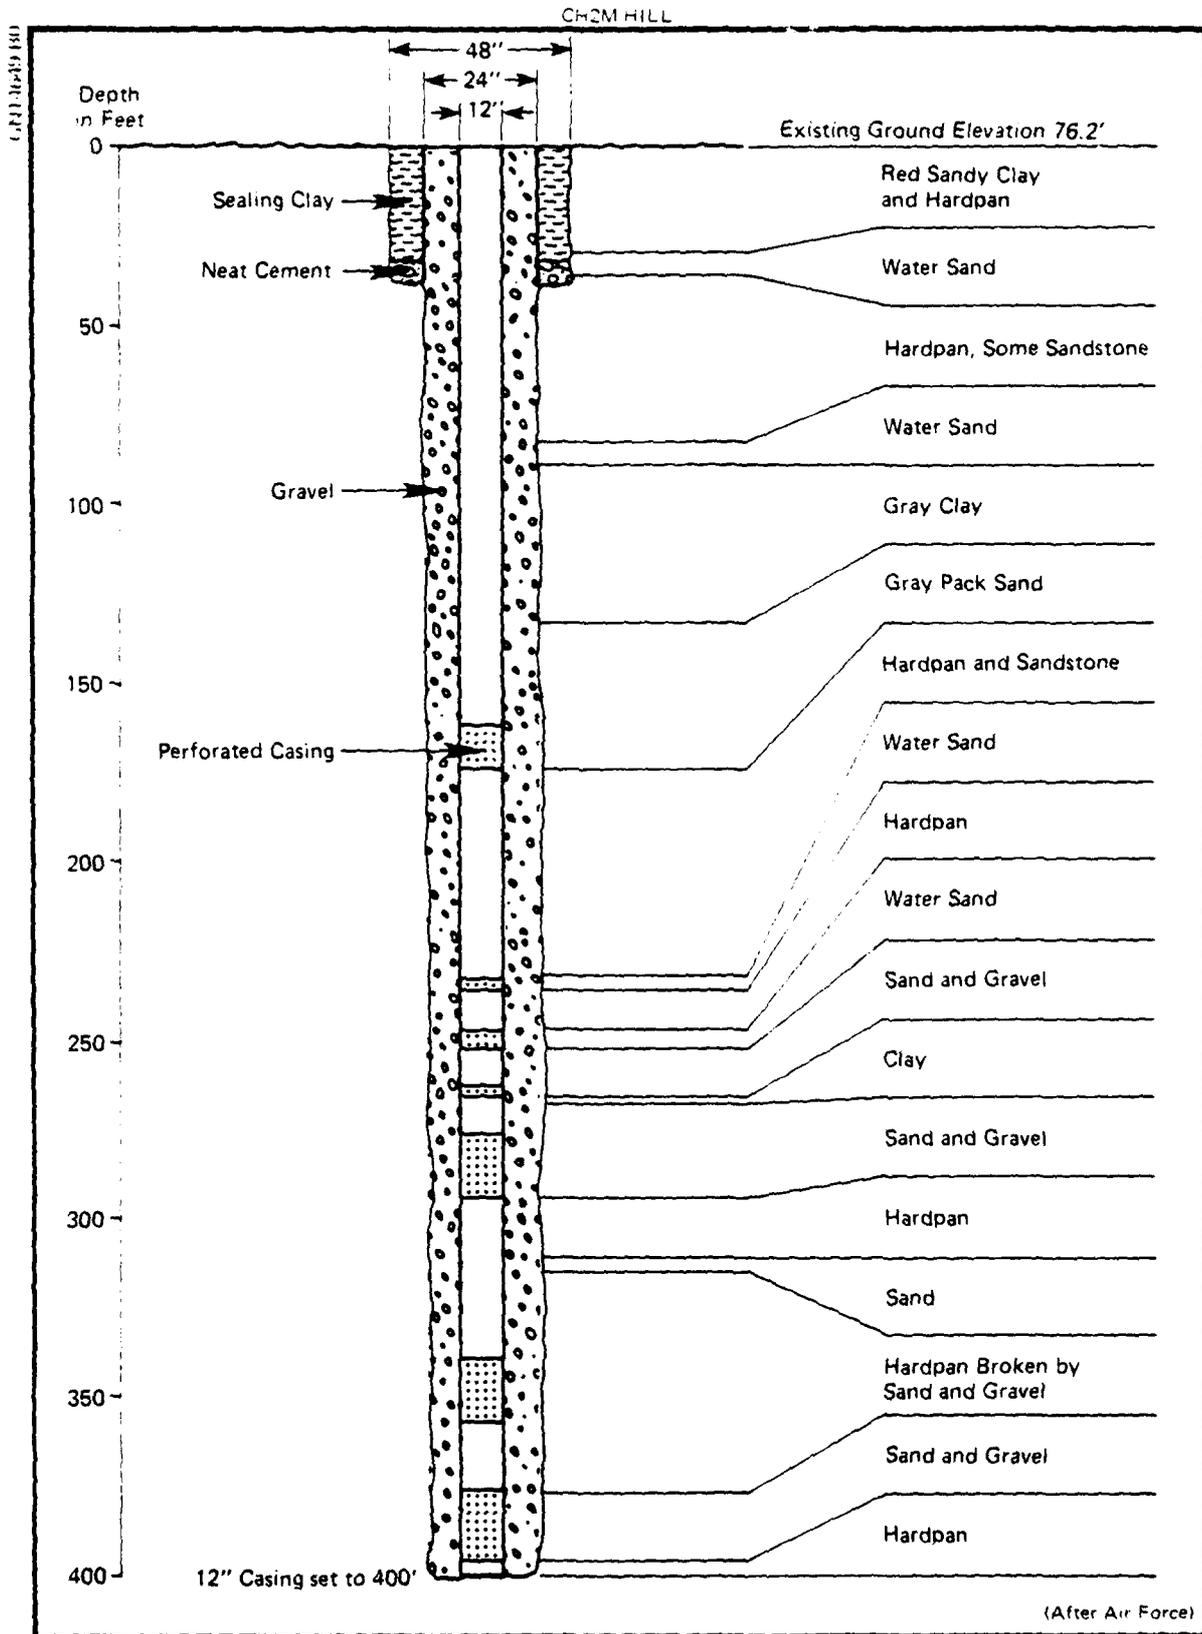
Log and well construction details of Well No. 1 at McClellan AFB.
